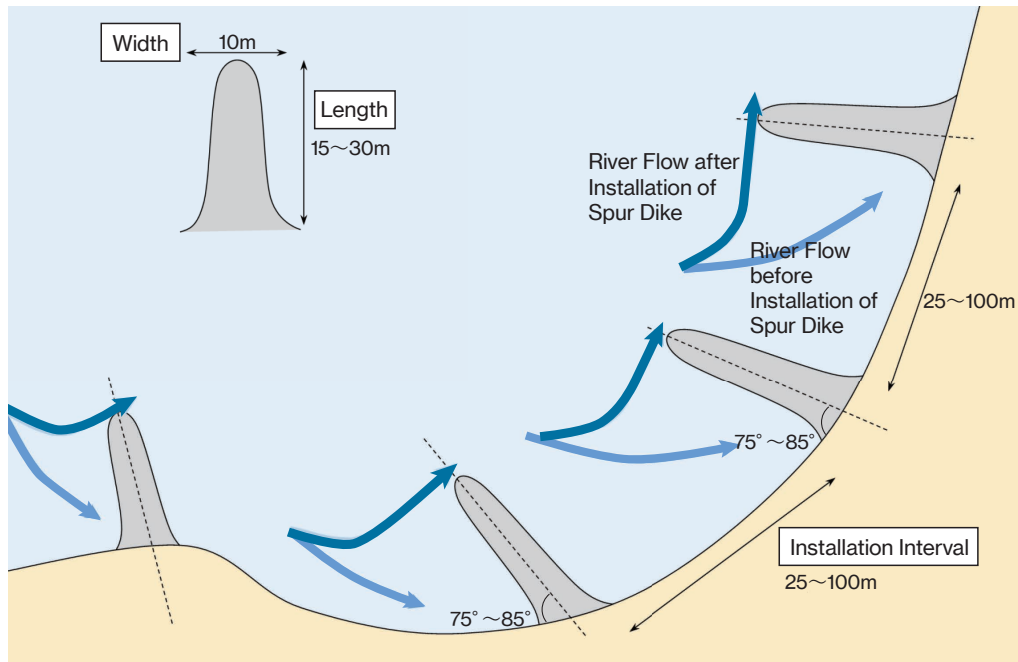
Example of a Stone Spur Dike Plane View ³⁾
